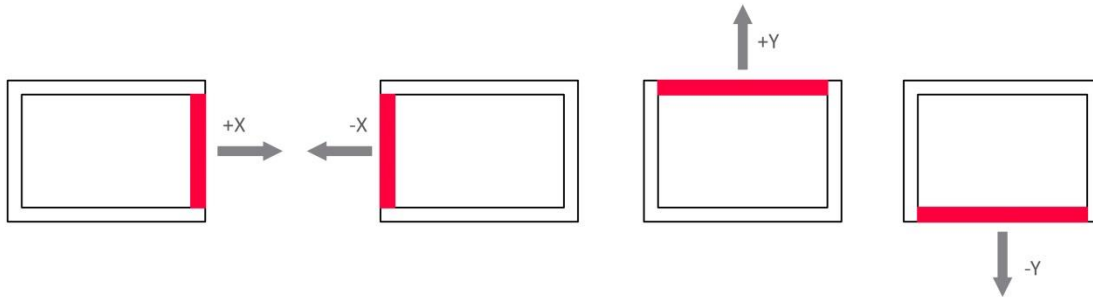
2: Wall to consider according to the loading direction evaluated (plan view)
